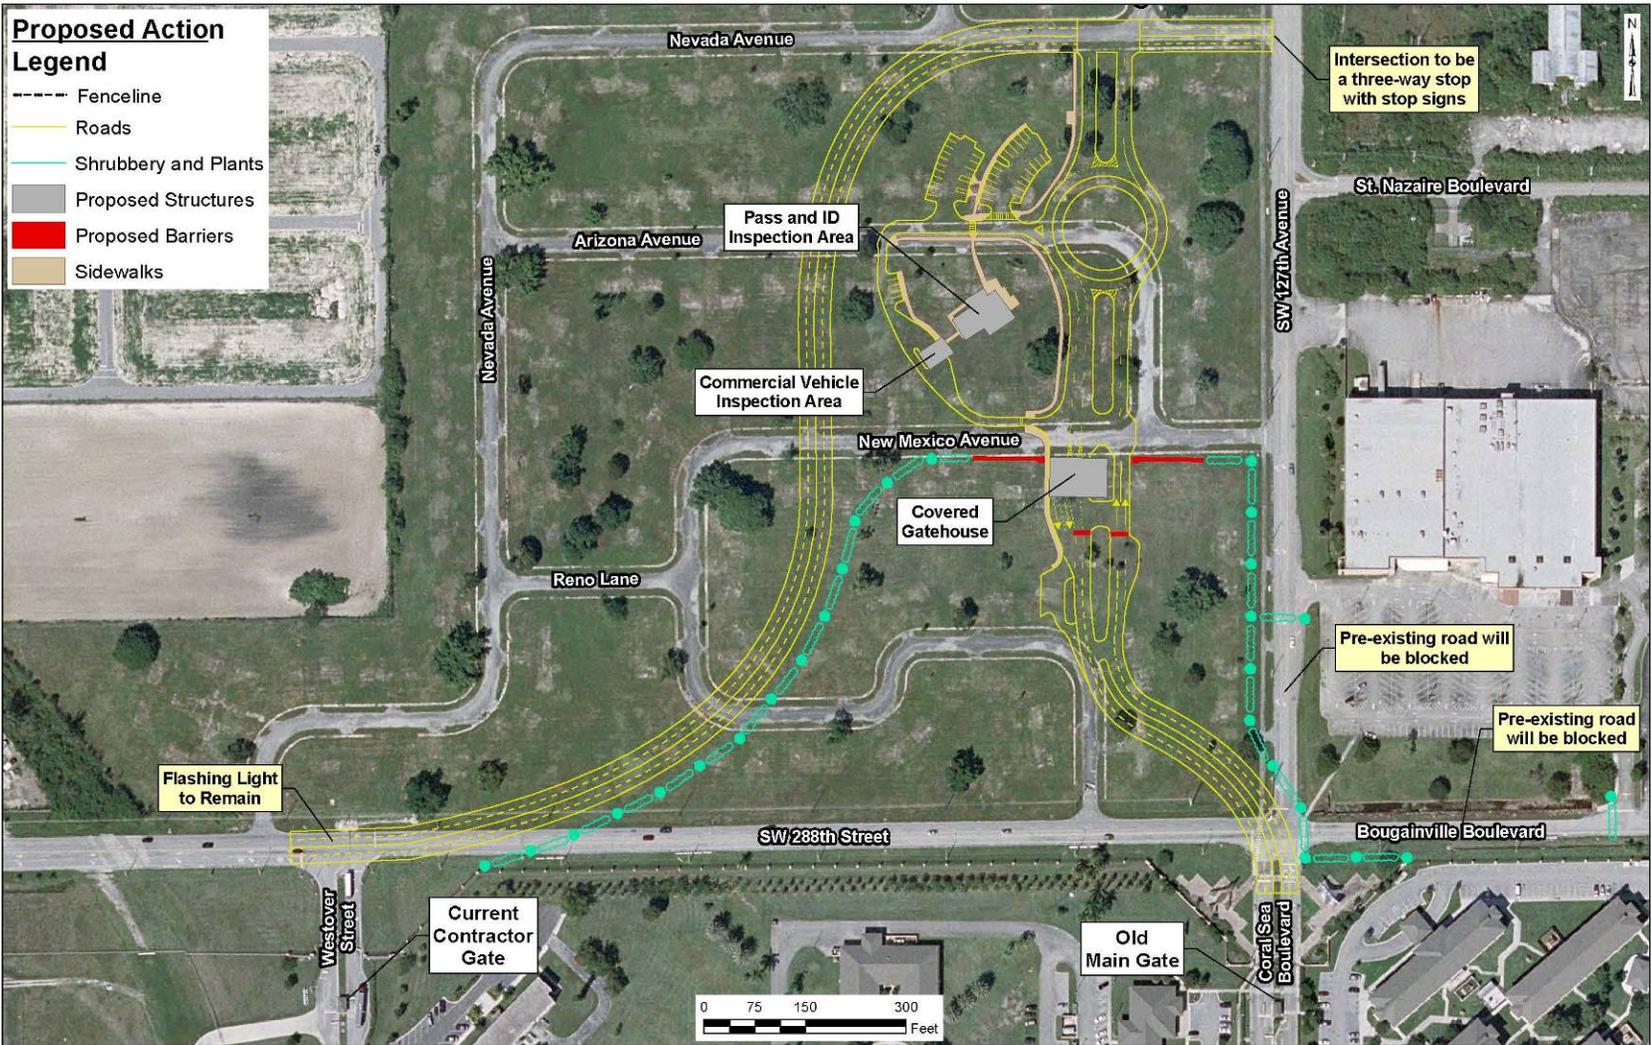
Preliminary Site Plan of the Proposed Action (Alternative #1)
